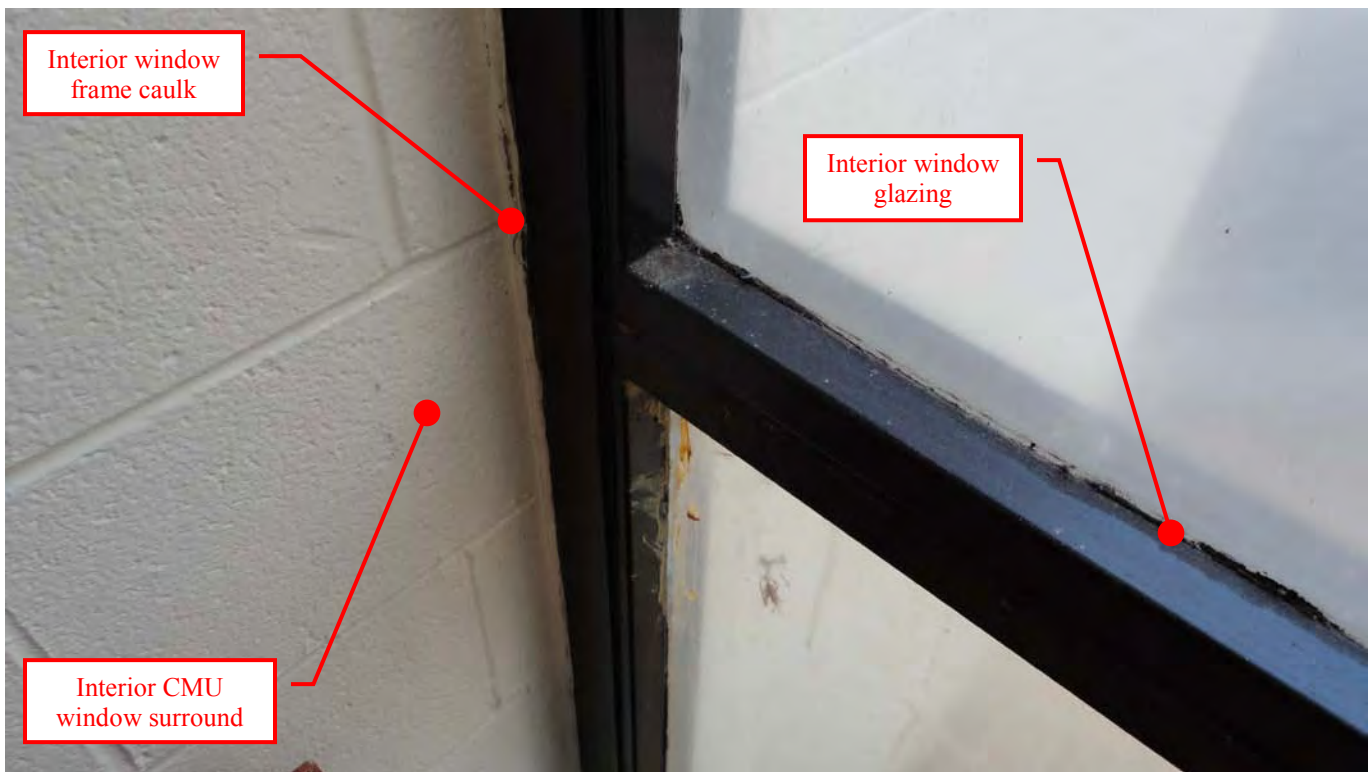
Typical corner classroom window frame caulk (vertical joint), window glazing (black) and wooden sill.
